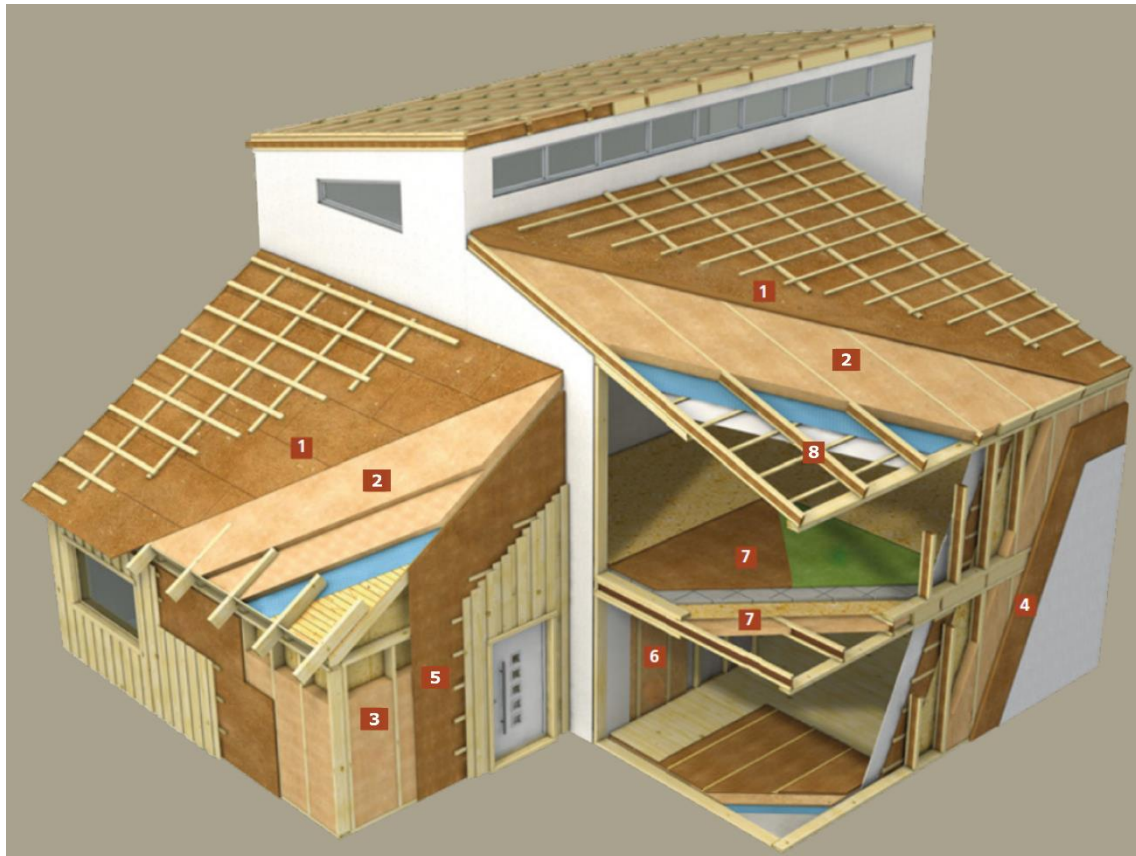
Applications of bio-based insulation materials: 1) wind barrier, 2) insulation between rafters, 3) cavity insulation, 4) external wall insulation system, 5) wall insulation panels applied between exterior wall and cavity wall or cladding, 6) insulation of lightweight partition walls and 7) floor insulation. Application of I-joists as rafters (8). Adapted from Dederich *et al.* (2019).
